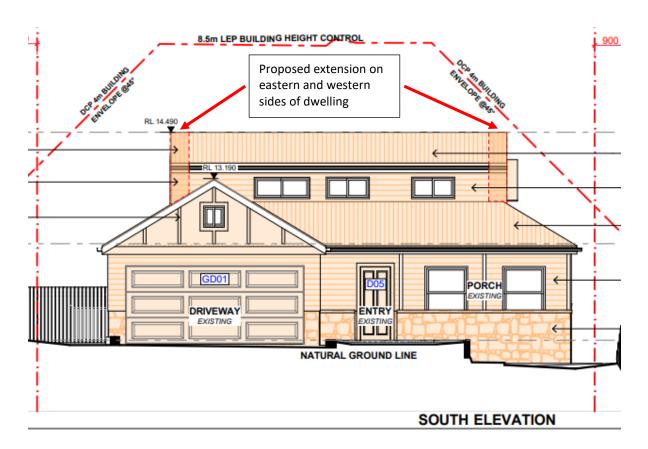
Extract from Architectural Drawing DA12, showing the proposed small extension to the roof at first floor level
